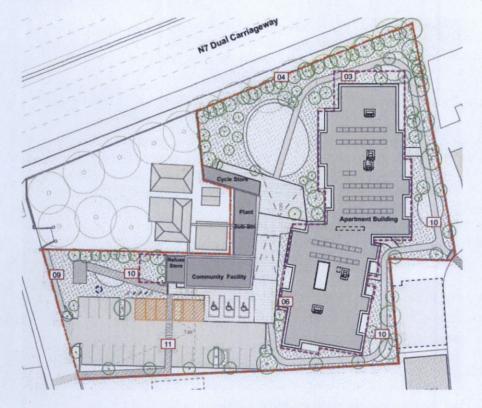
Revised Site Layout including Revised Internal Pedestrian Footpath Layout (11)
